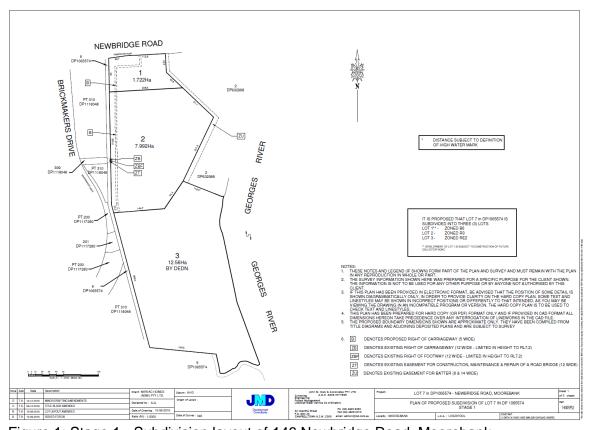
Stage 1 - Subdivision layout of 146 Newbridge Road, Moorebank
